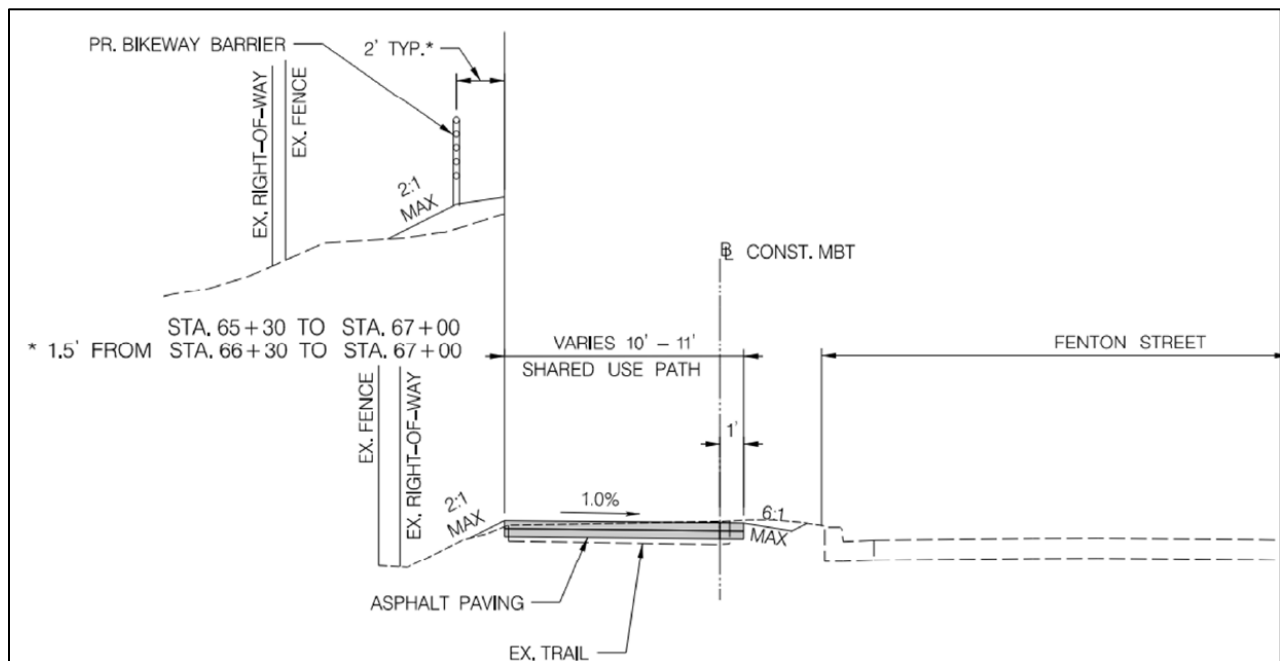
Proposed Cross Section - Station 65+30 to 67+00 Looking North
